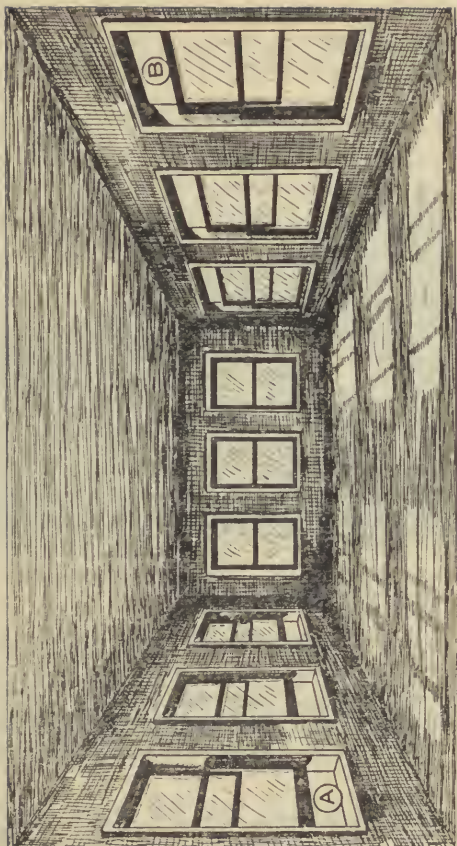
Ventilation of squad room showing arrangement of window openings.
